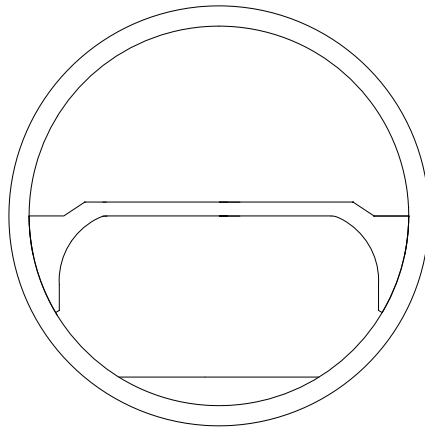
Cross-section of the Barcelona's underground railway Line 9 double-deck circular tunnel.
